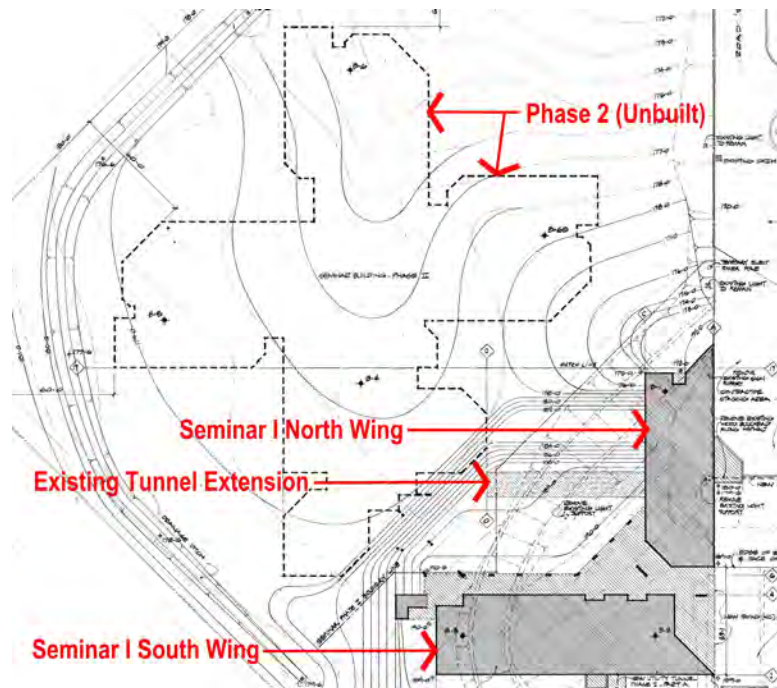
Original site plan, showing existing and intended development. (Note: Above the ground floor the south and north wings are linked as depicted by the lighter hatch pattern.)
